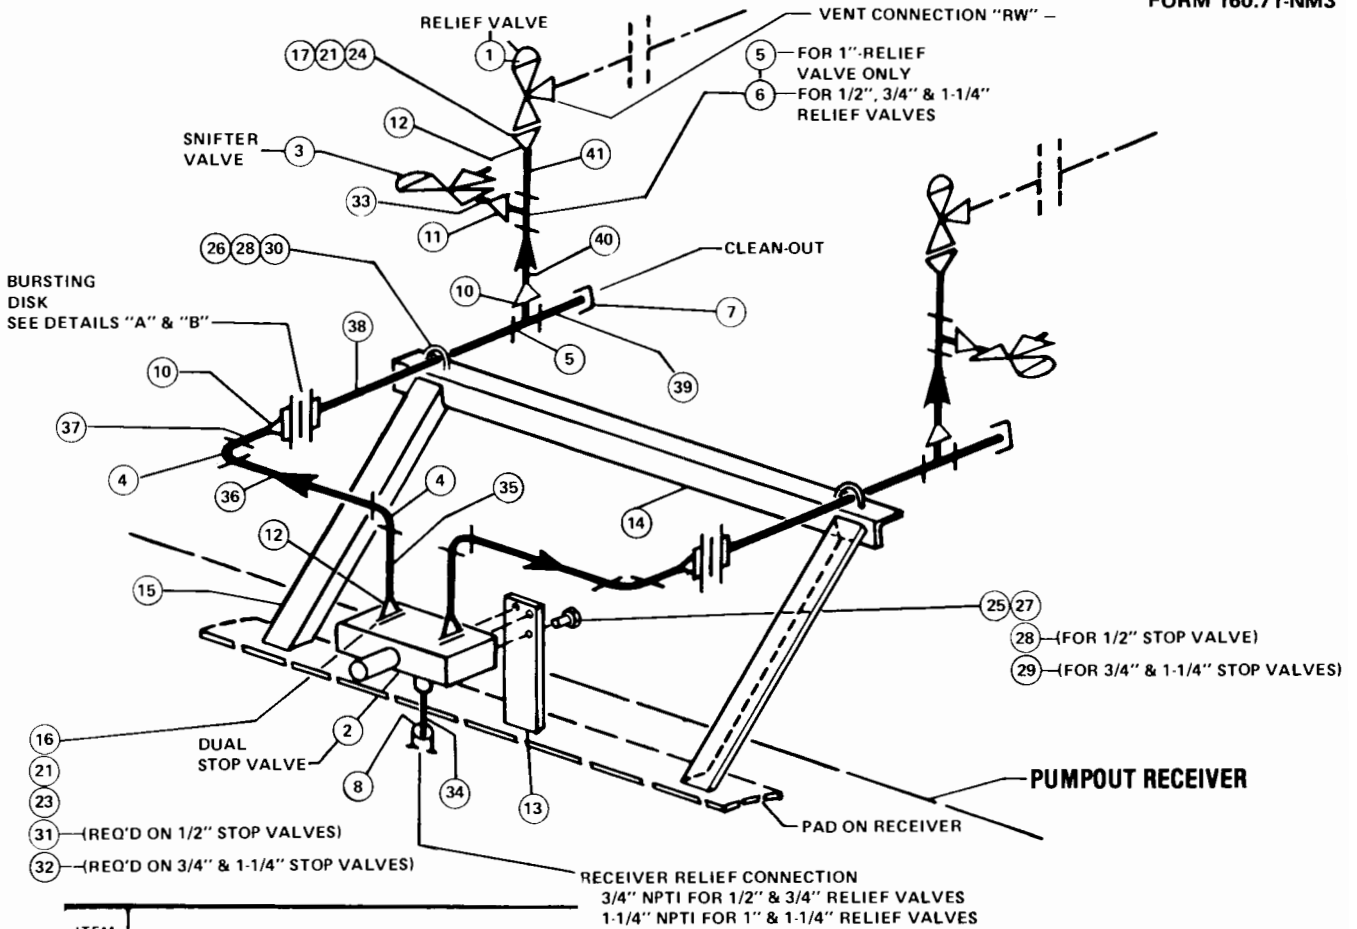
TYPICAL PIPING — MODEL RTU — 3 TRANSFER UNIT AND RECEIVER
